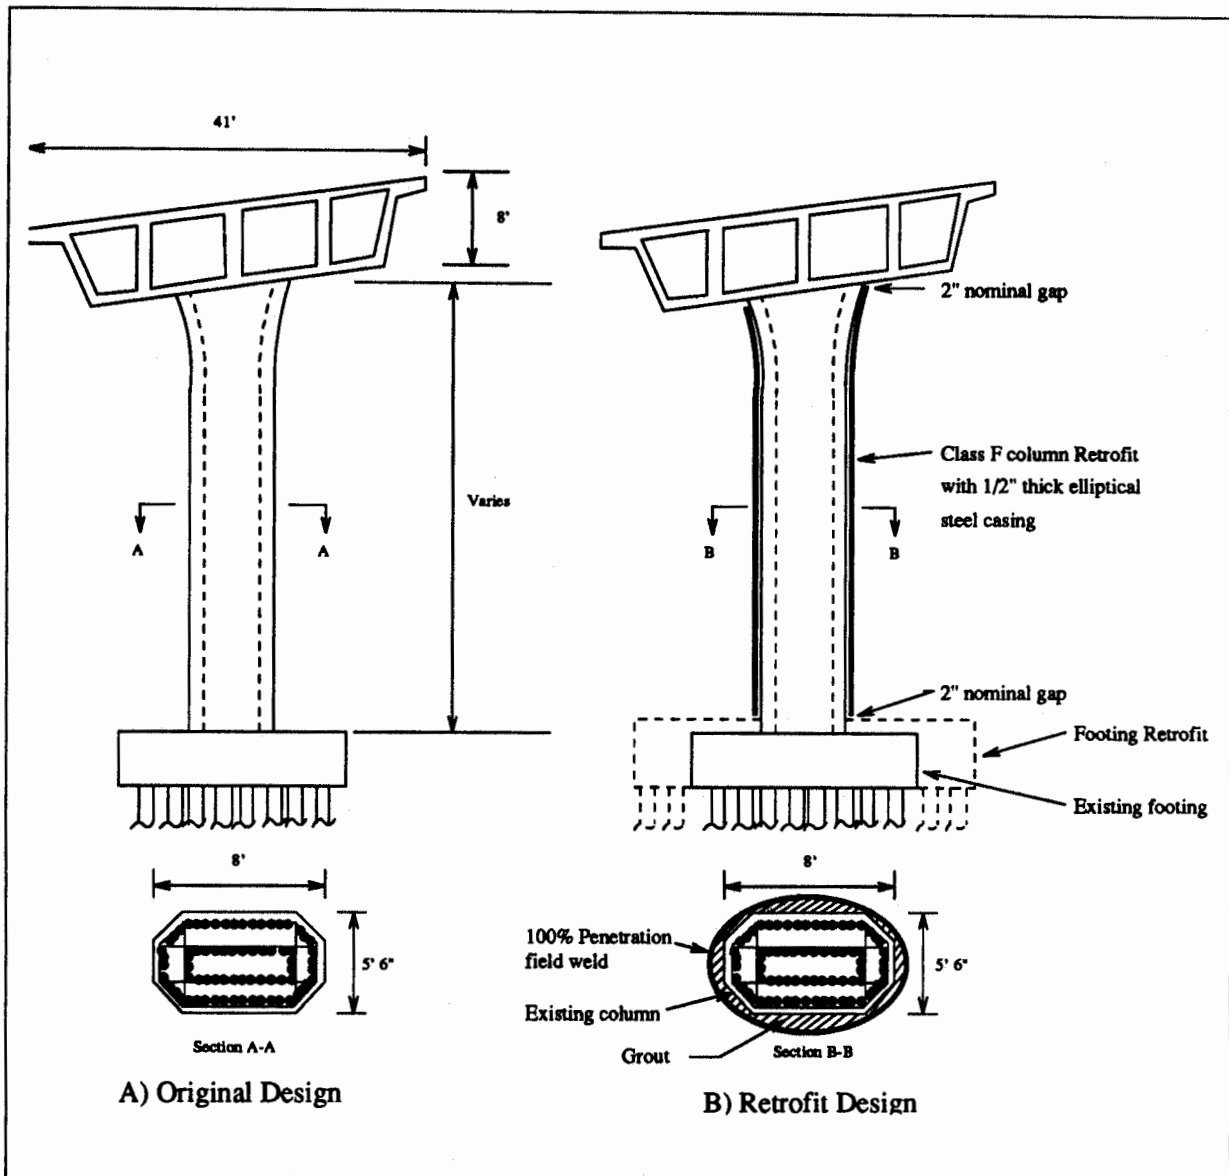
Single Column Bent and Box Girder Cross-Section.
